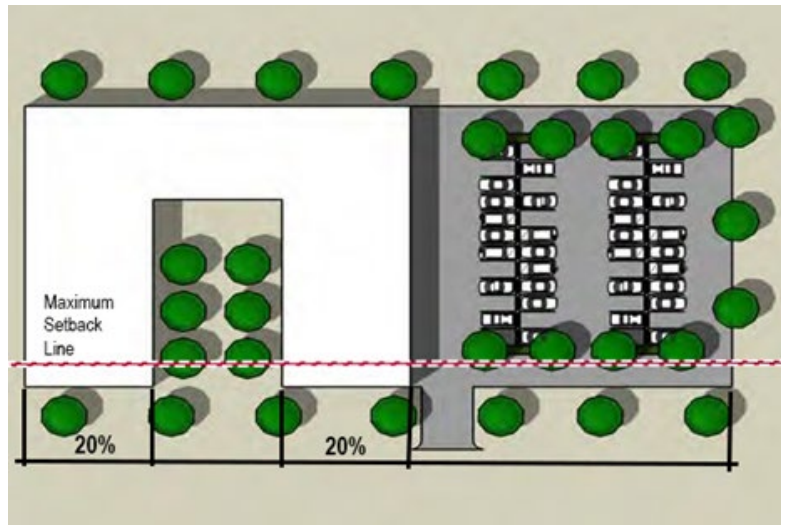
(A)(2)(S5). The facades of a courtyard-style building occupy a minimum of 40% of the site frontage (between minimum and maximum setbacks).
